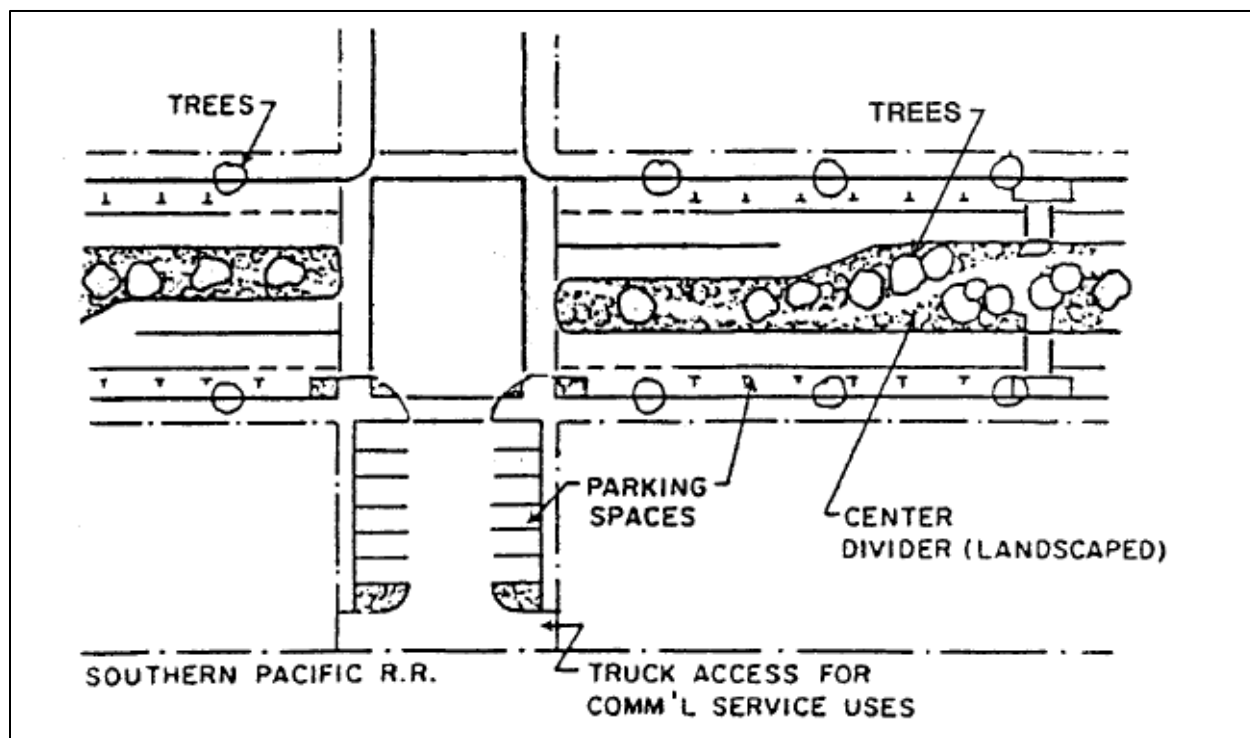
El Camino Real Parkway - Santa Margarita and Templeton
